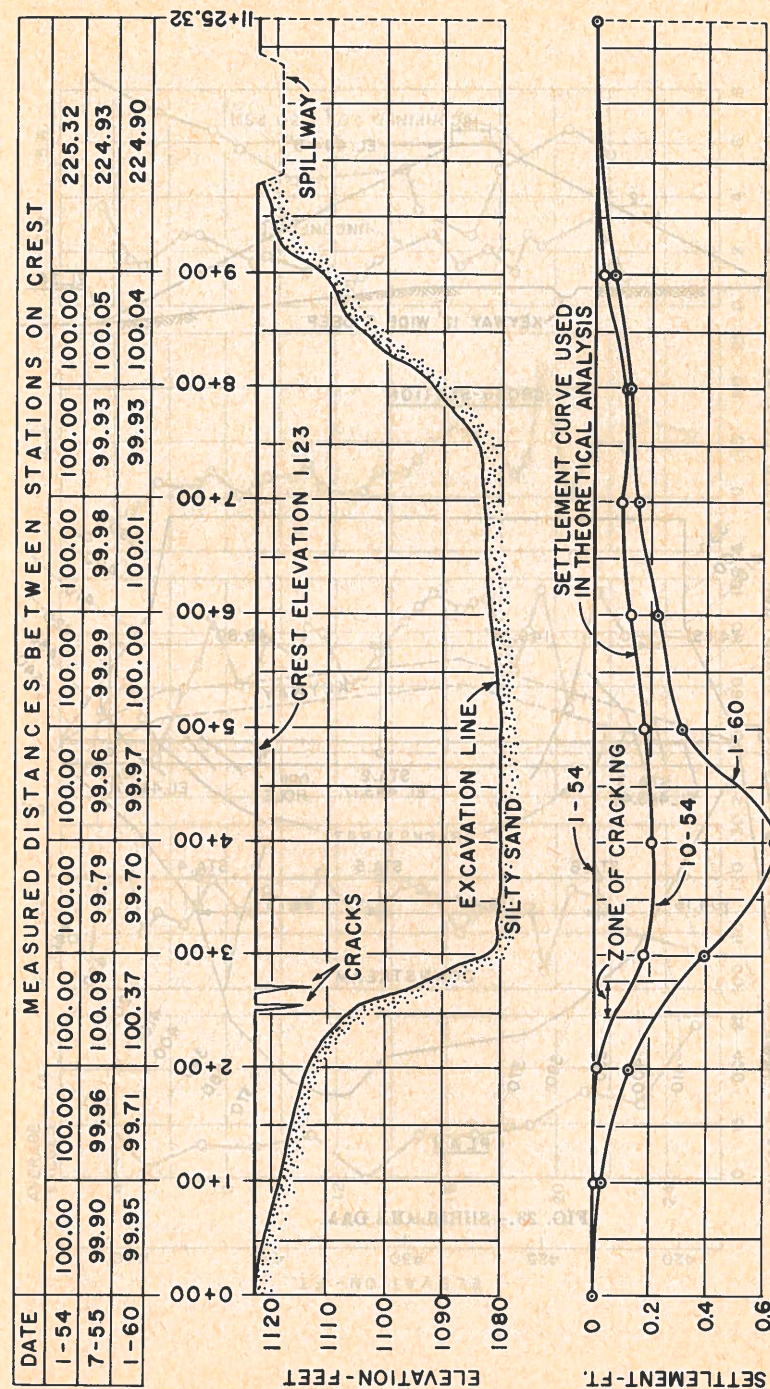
WOODCREST DAM: PROFILE AND CREST SETTLEMENTS AT CRACKING
